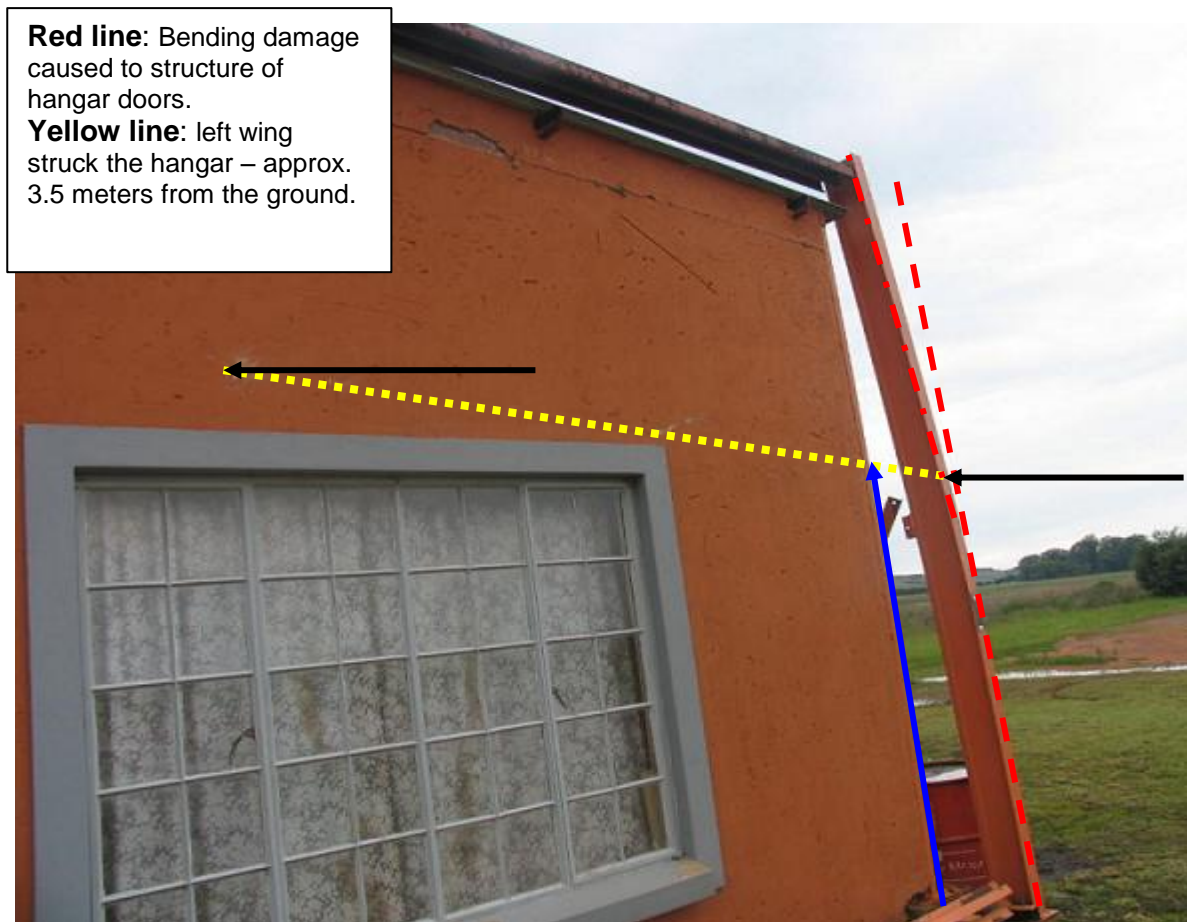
, showing the height at which the left wing struck the hangar and damage caused to structure of hangar doors.
